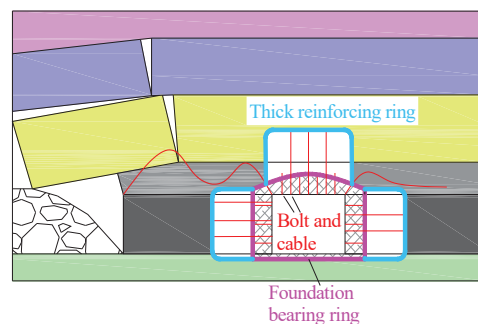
Surrounding rock-bearing structure after reinforcement and support with anchor cable.
